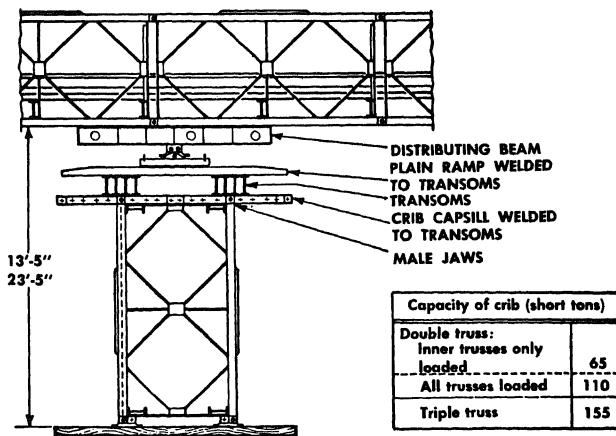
Panel crib piers with expedient flat tops and rocker bridge bearing under continuous bridge. Single- to double-story single-bay crib with panels vertical.
